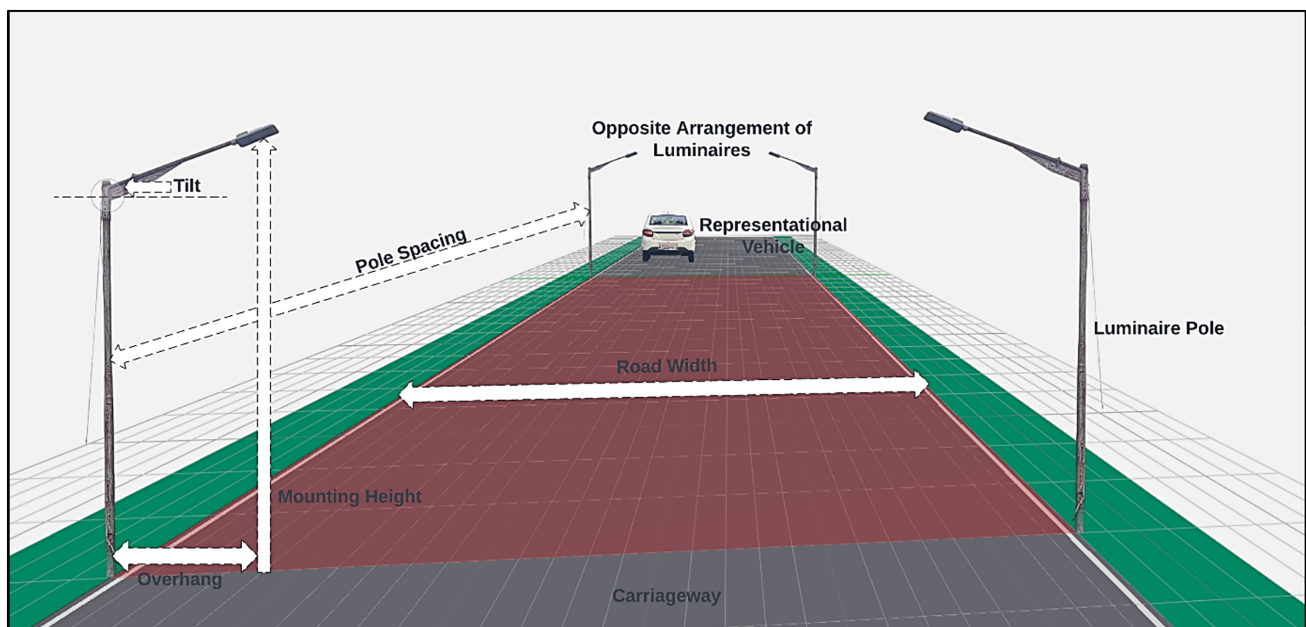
Visualization of an archetype road segment with the opposite arrangement of luminaires
